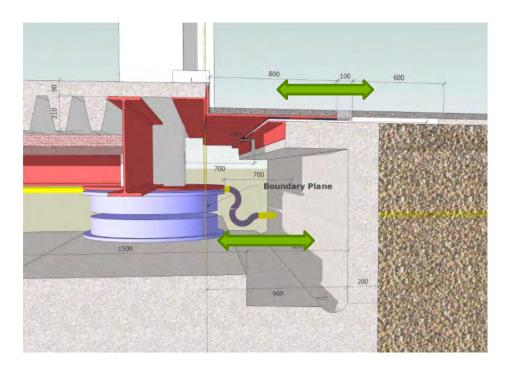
Typical Image of a base isolator within a shallow basement behind a boundary line
